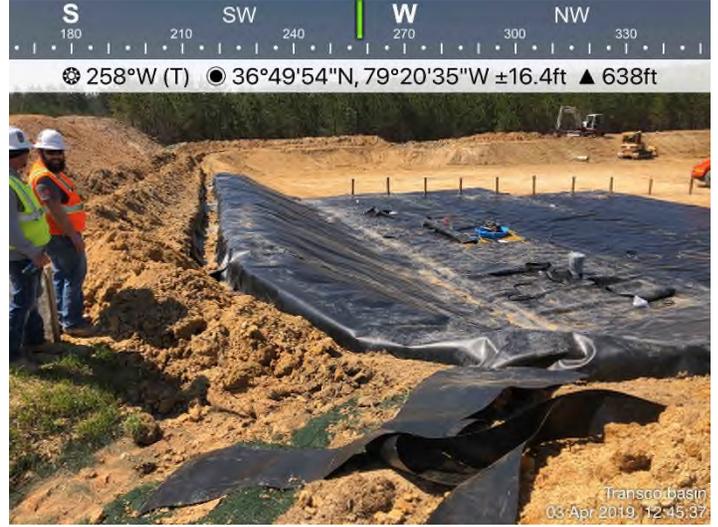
Permanent Stormwater Pond – Outfall.
